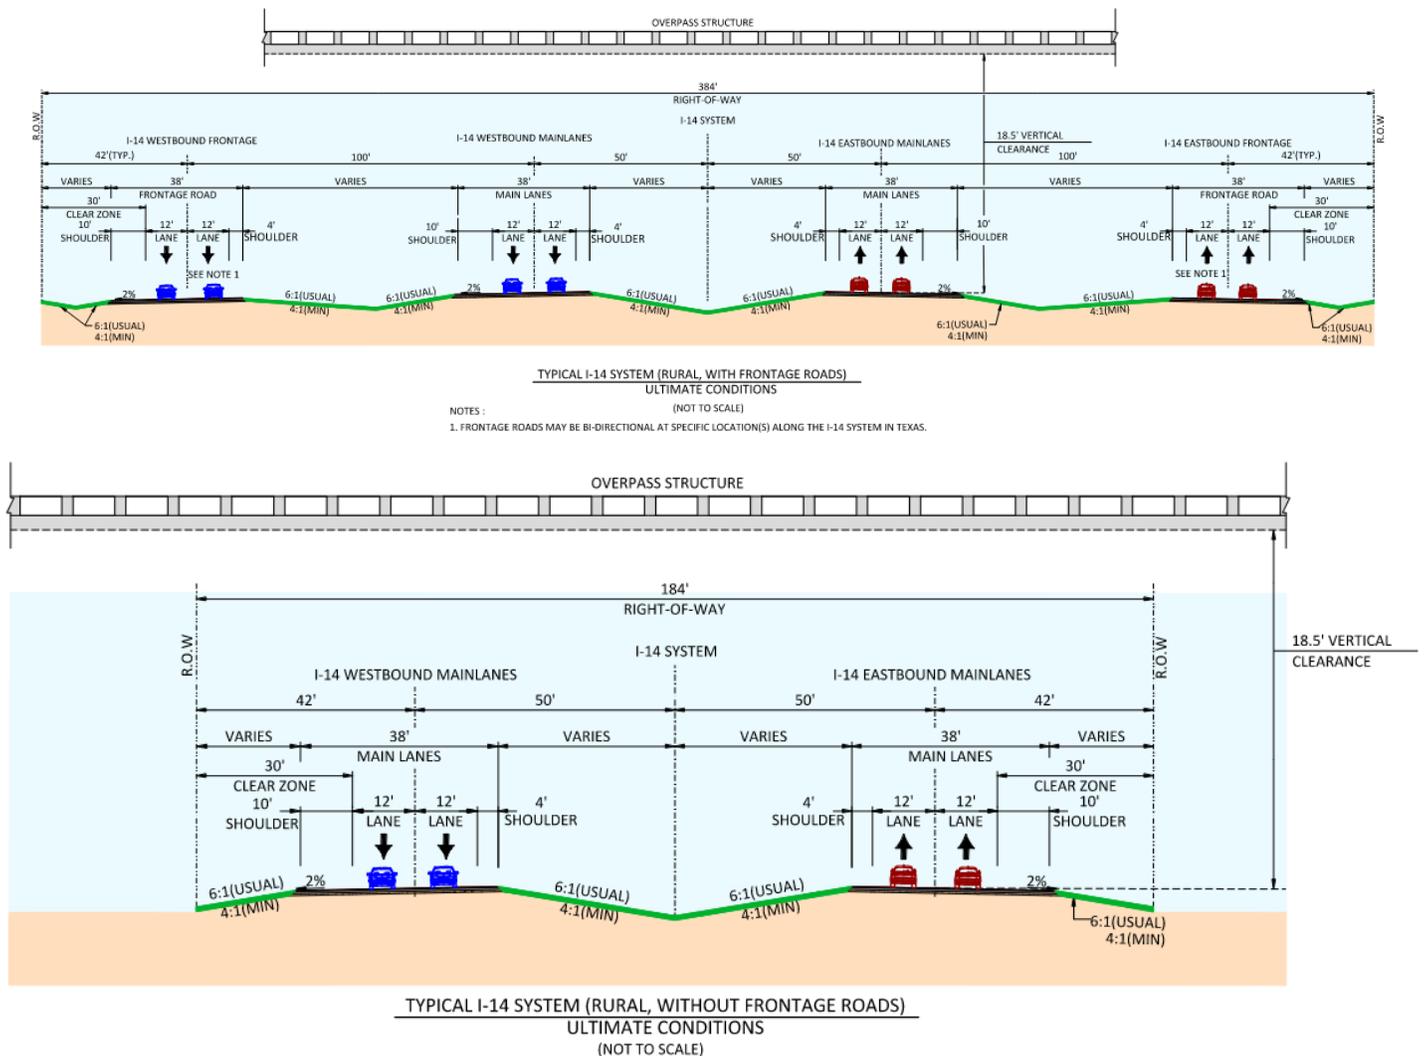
Typical I-14 System (Rural, with and without Frontage Roads)
